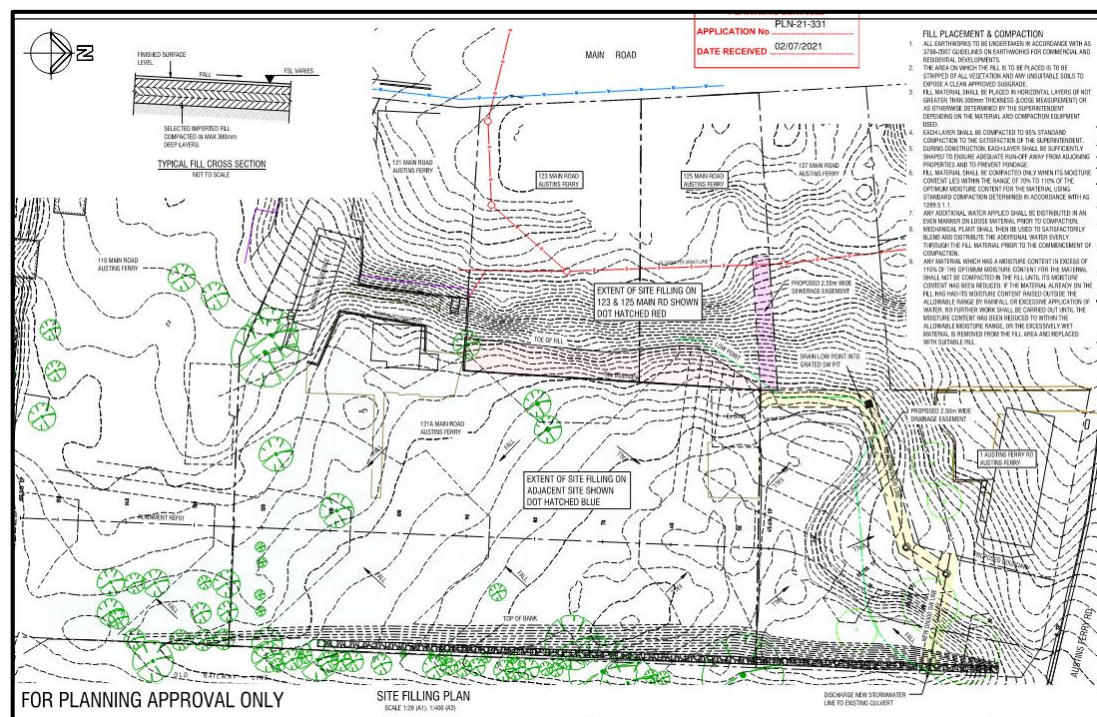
Site plan 123 and 125 Main Road, Austins Ferry.
